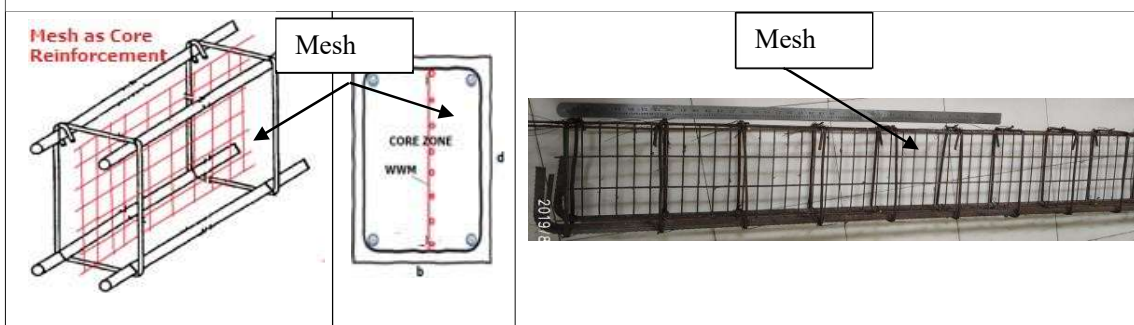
Reinforcement cage with mesh as longitudinal core reinforcement apart from stirrups and its cross section
